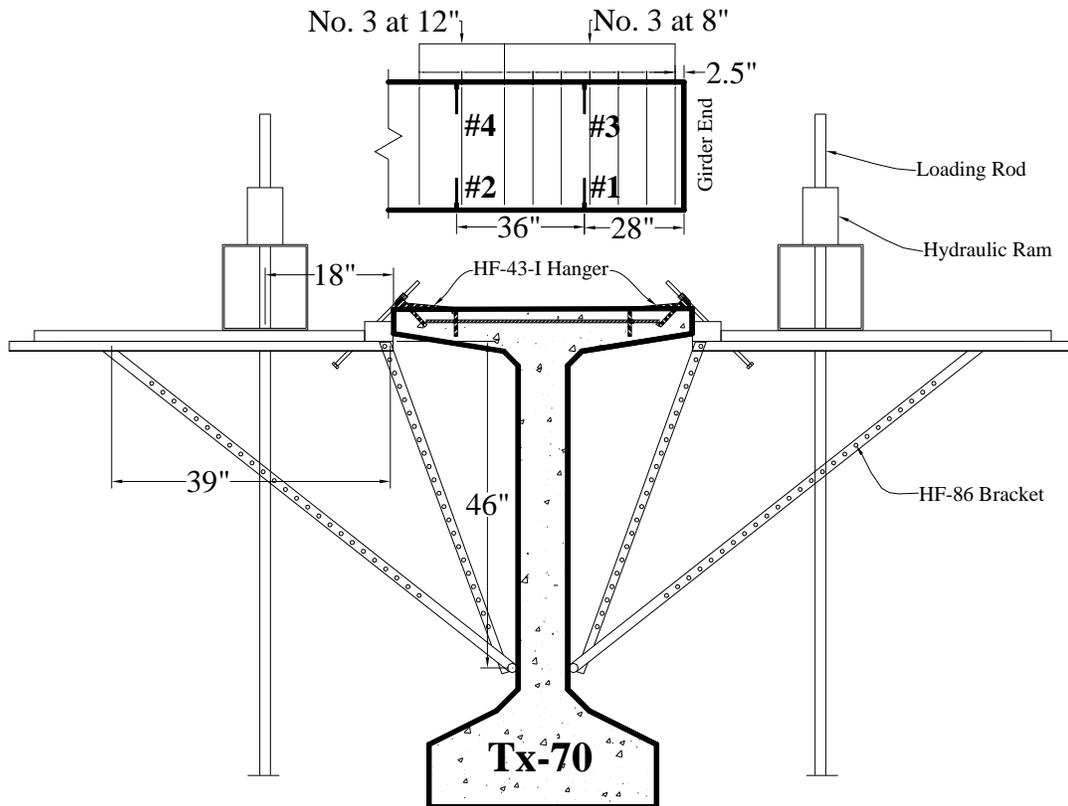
Reinforcement pattern and loading geometry for HF-43-I on Tx-70
